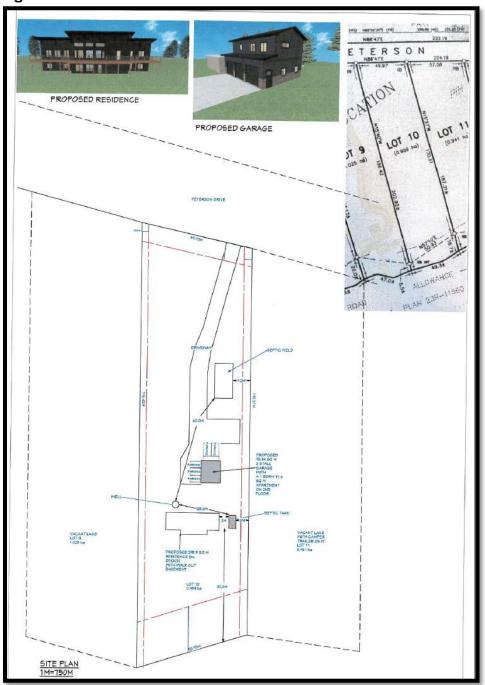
Aerial sketch displaying subject area of proposed rezone boundaries
